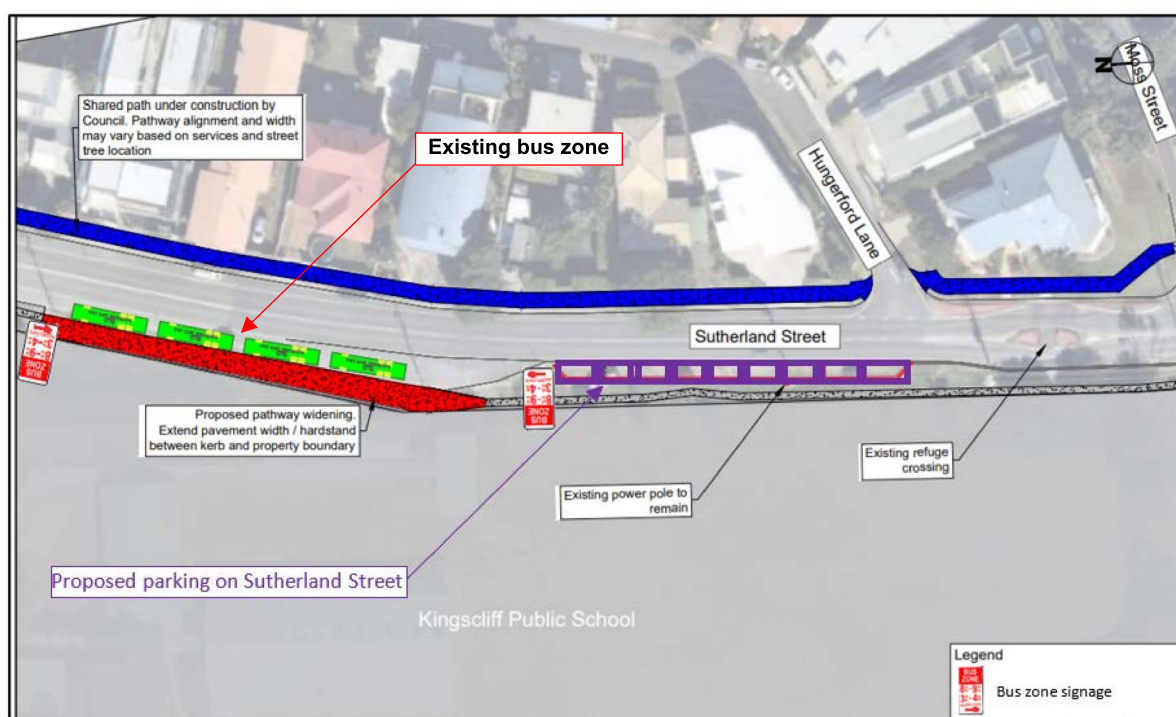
| Location of additional parking proposed on Sutherland Street (Source: Applicant's RtS 2021)
